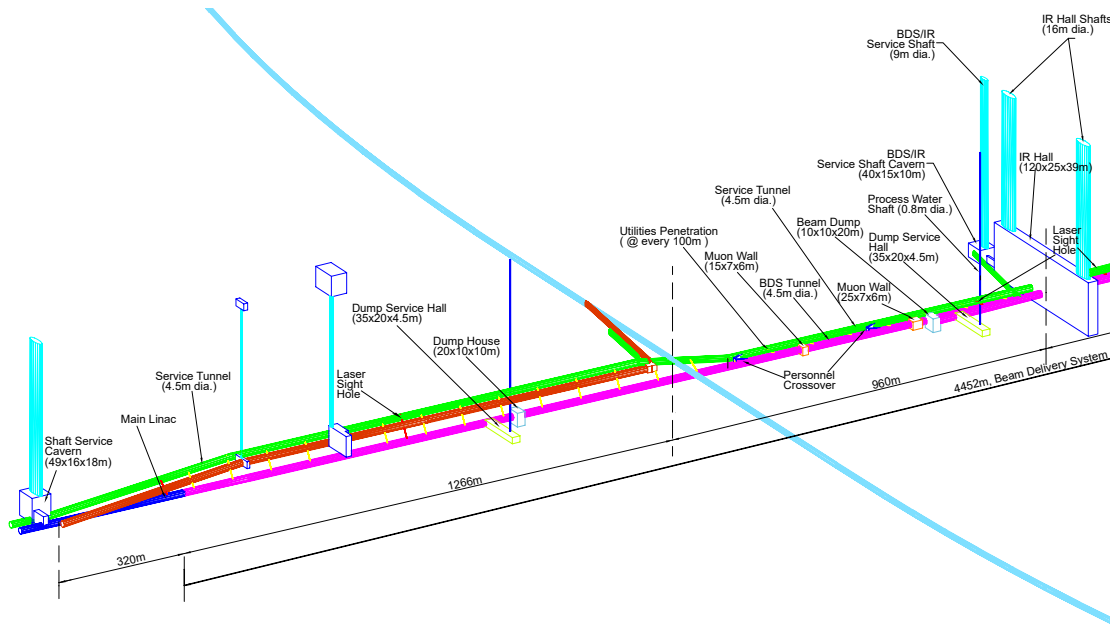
BDS layout, beam and service tunnels (shown in magenta and green), shafts, experimental hall. The line crossing the BDS beamline at right angles is the damping ring, located 10 m above the BDS tunnels.
